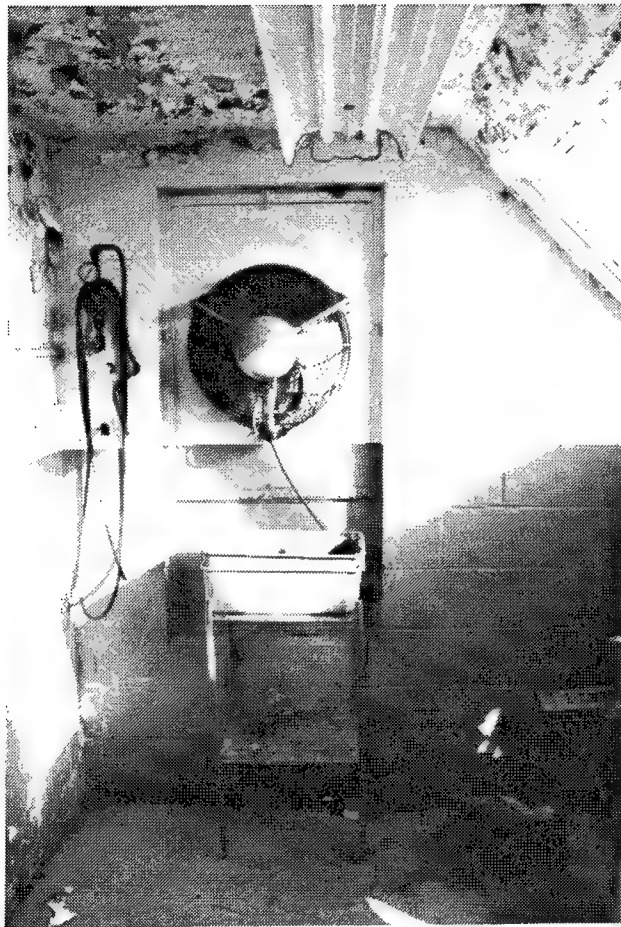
Building 56E: Interior of Firing Range Observation Building.
